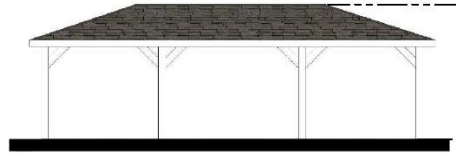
EXHIBIT E: Phase 2 Building Addition and Covered Patio
